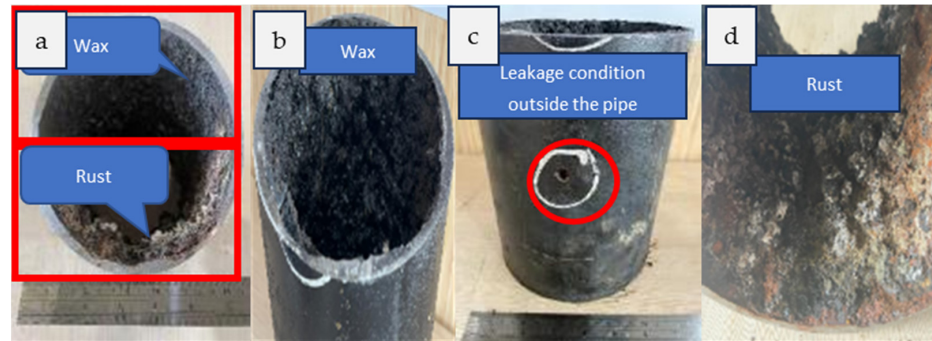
Visual Inspection. (a) Visual inspection of samples; (b) Visual inspection of wax; (c) Leakage condition outside the pipe; (d) Visual inspection of rust.
